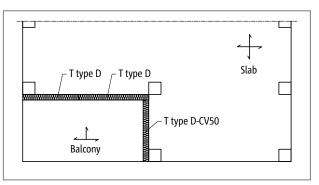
Schöck Isokorb® T type D: Use in flat slabs
